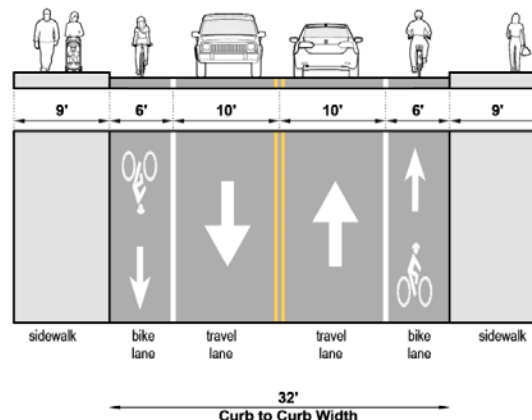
Proposed conditions on 9th Street between Jackson Street and the I-94 Bridge*.
